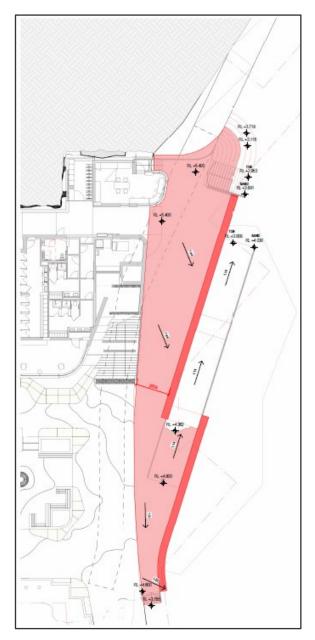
Extent of seawall and related element works for Detailed Design by RHDHV. Subject to design development
